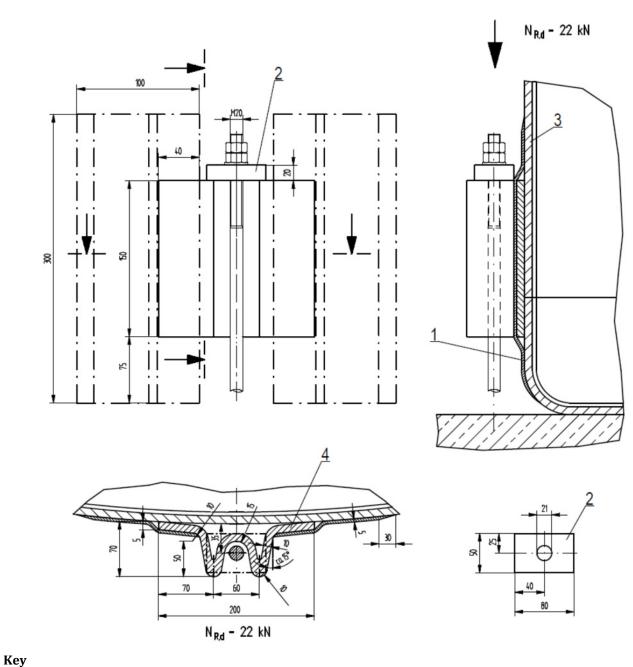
Typical anchorage arrangement for flat bottom tanks
